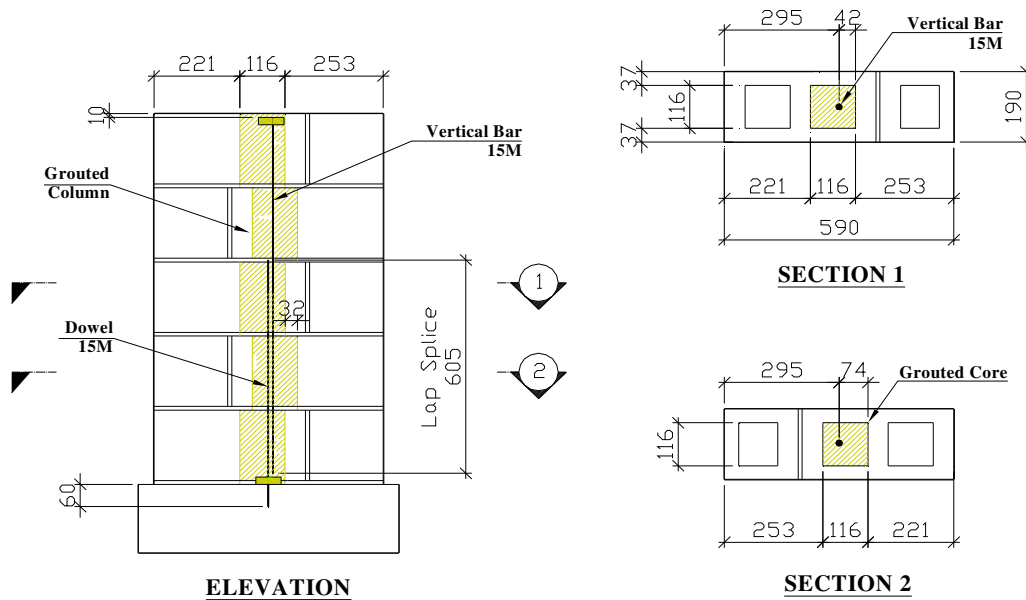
Type B wall test specimens (Dimensions in mm).
